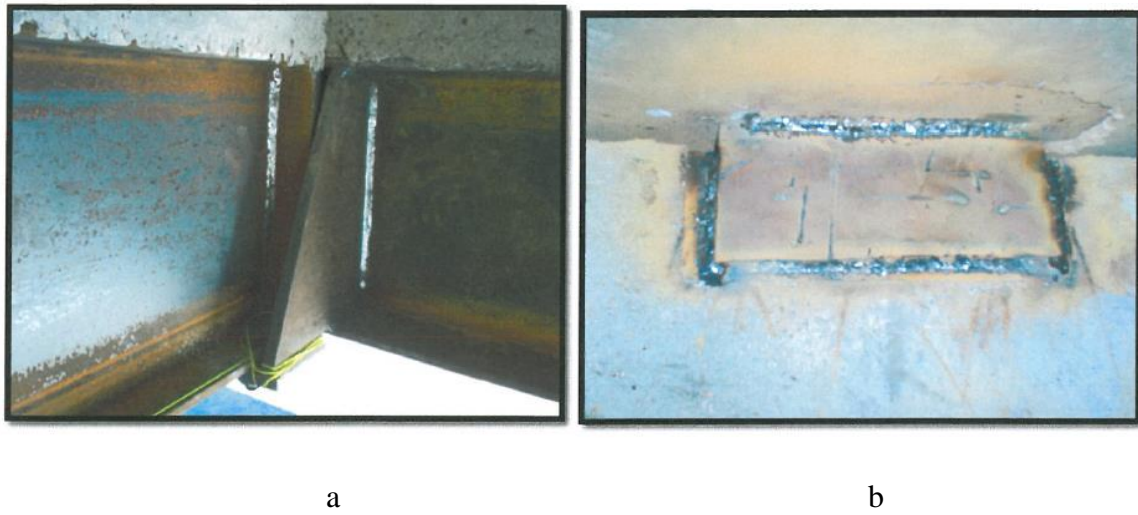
Panel Connections a) Saddle Connection b) Slab-to-Girder Connection
